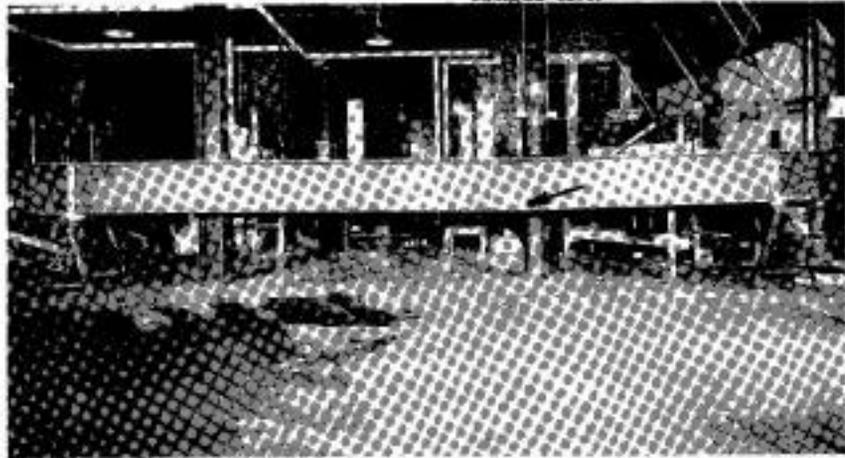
Elevation of Des Moines beam (side 1) after fatigue failure.
